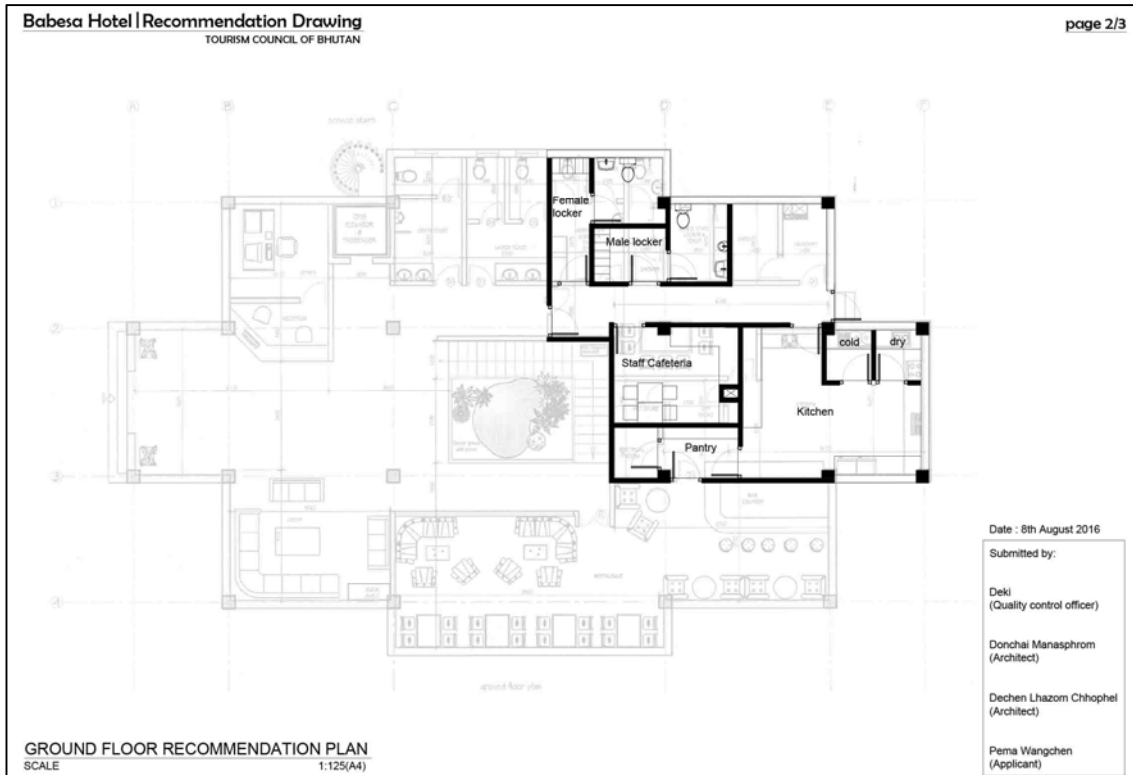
Recommendation drawings of new Babesa hotel.
